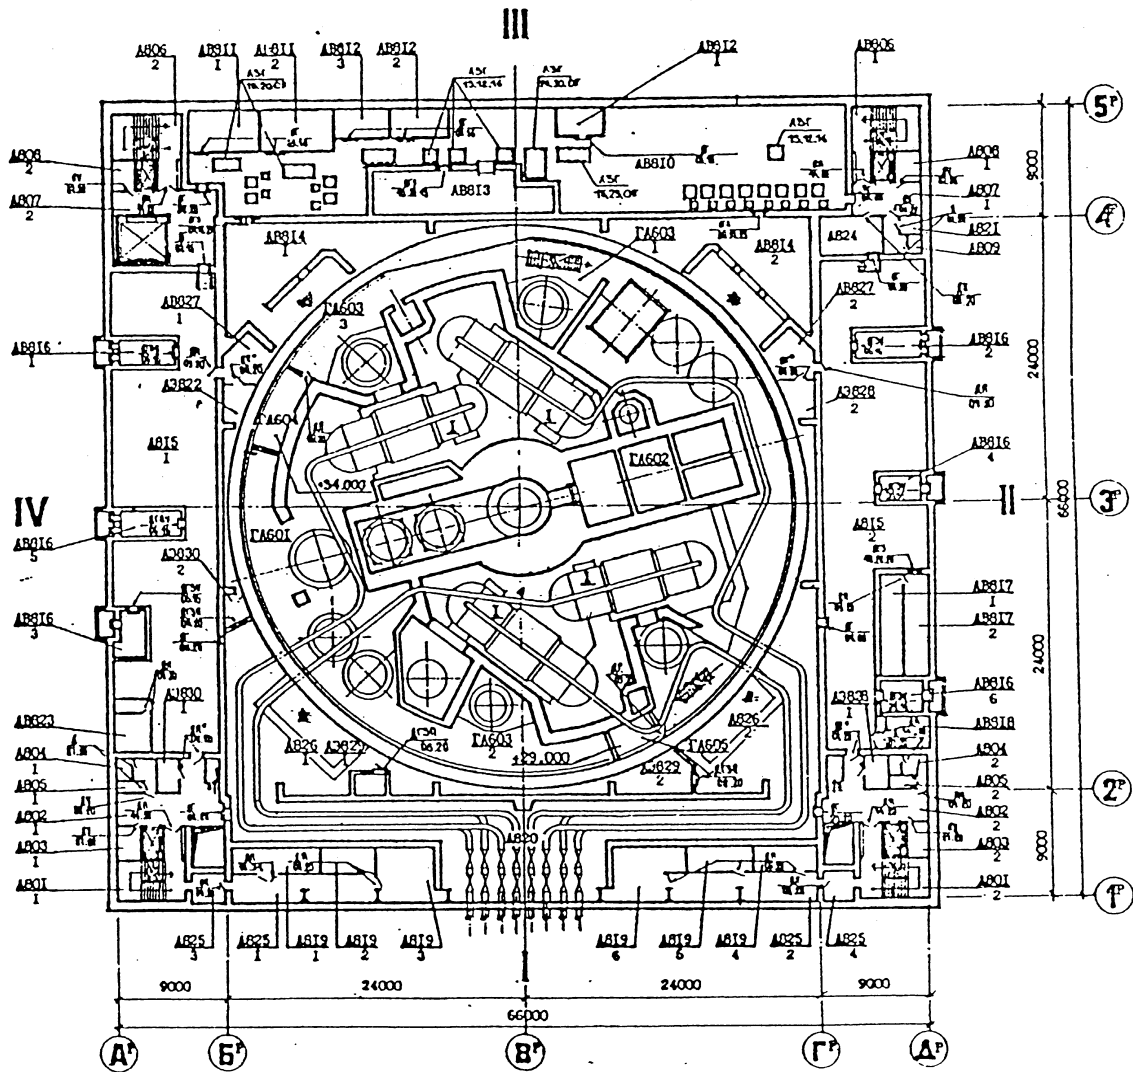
Plan view of a WWER-1000 MW reactor building.
